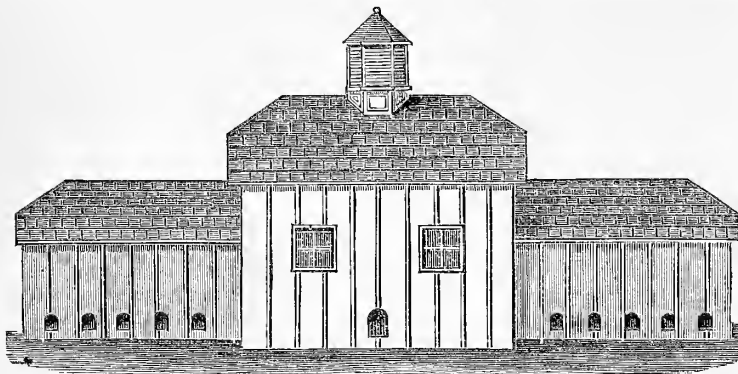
FRONT ELEVATION OF POULTRY HOUSE.
